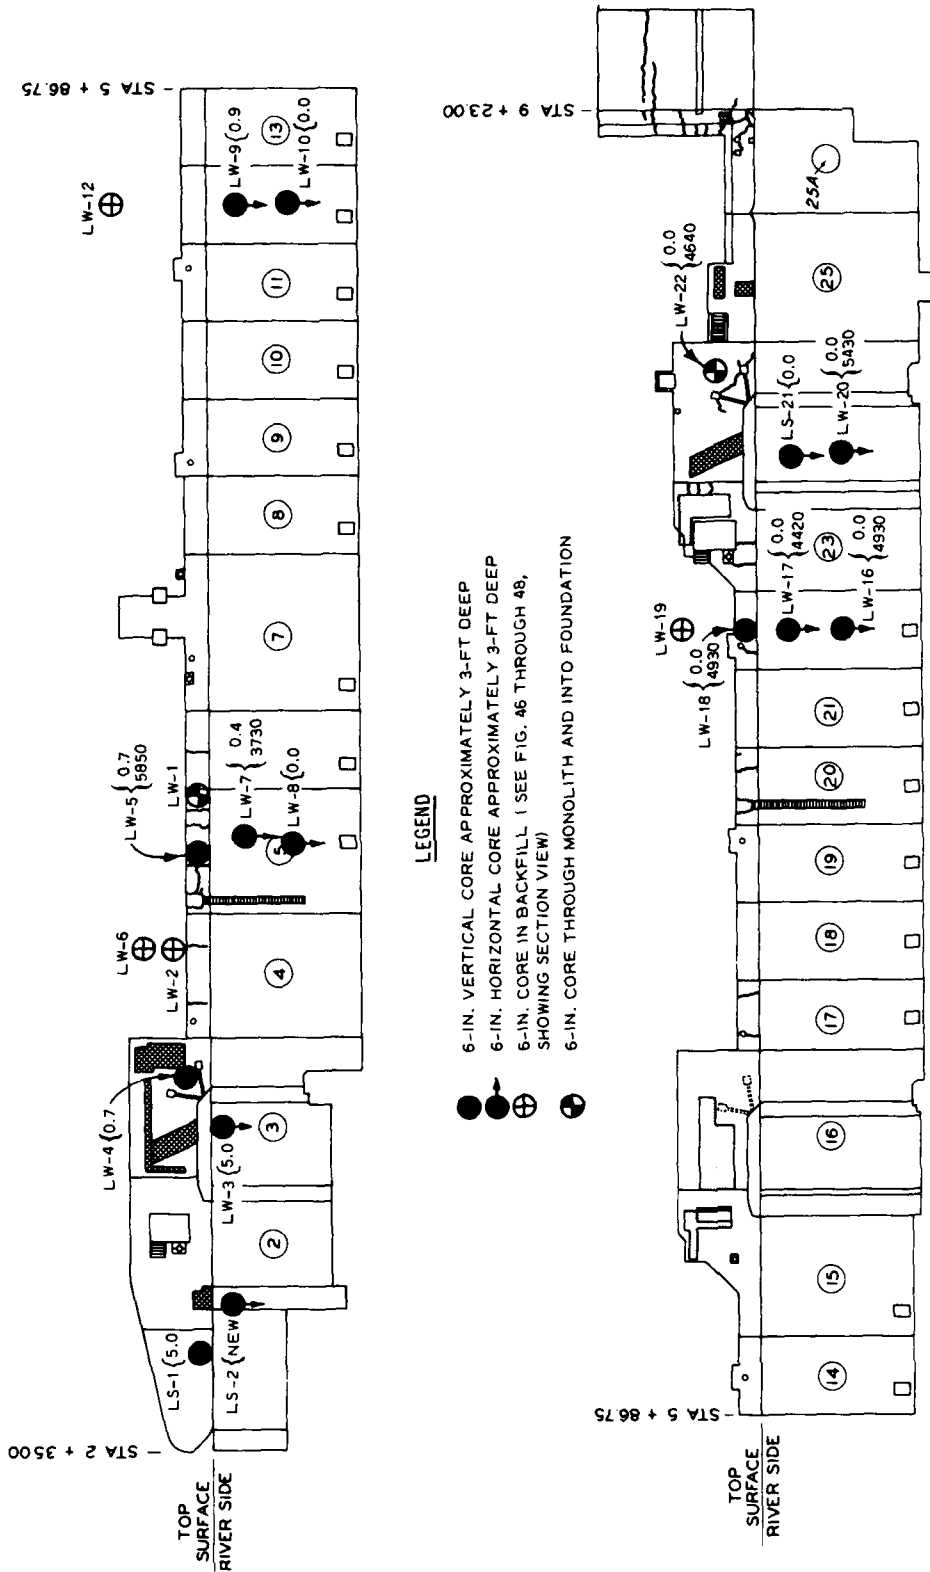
Core locations, depth of deteriorated concrete, and compressive strength below deteriorated concrete--land wall
